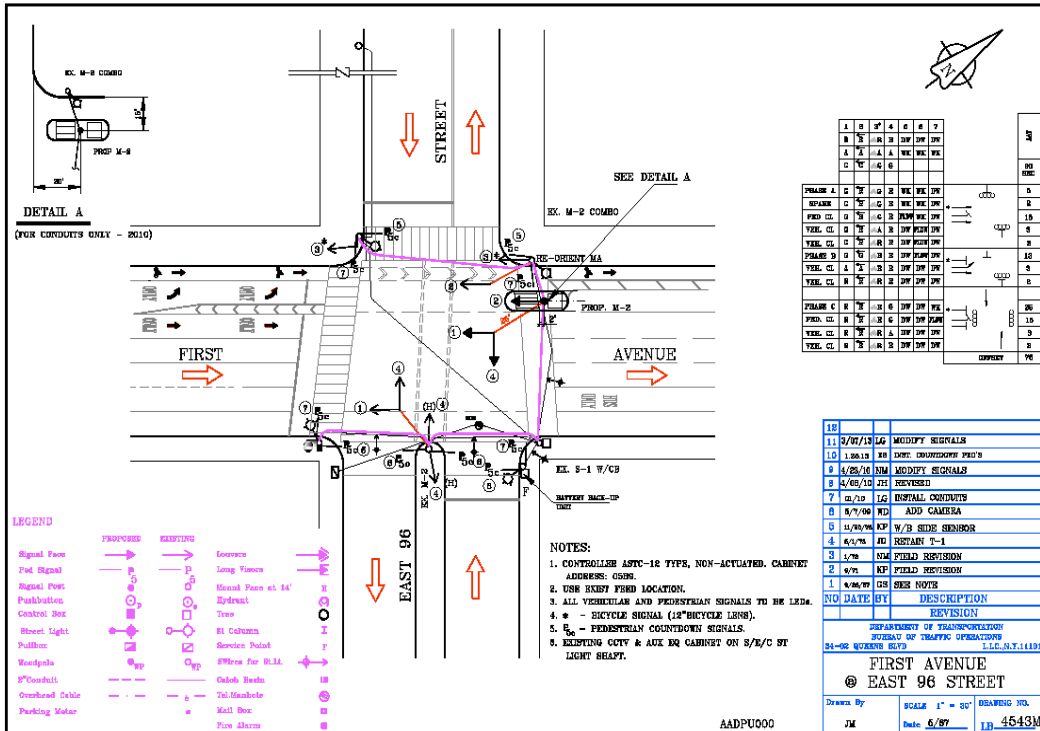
Completed Intersection Design Drawing after Phasing and Timing Plan Added, 1st Avenue at 96th Street
